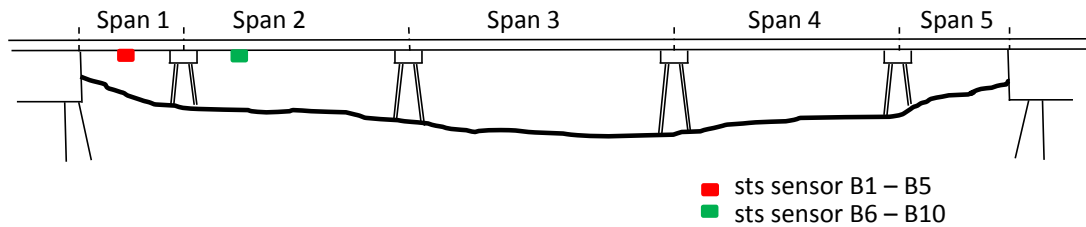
Elevation view of STS sensors for Patcong Creek Bridge validation
